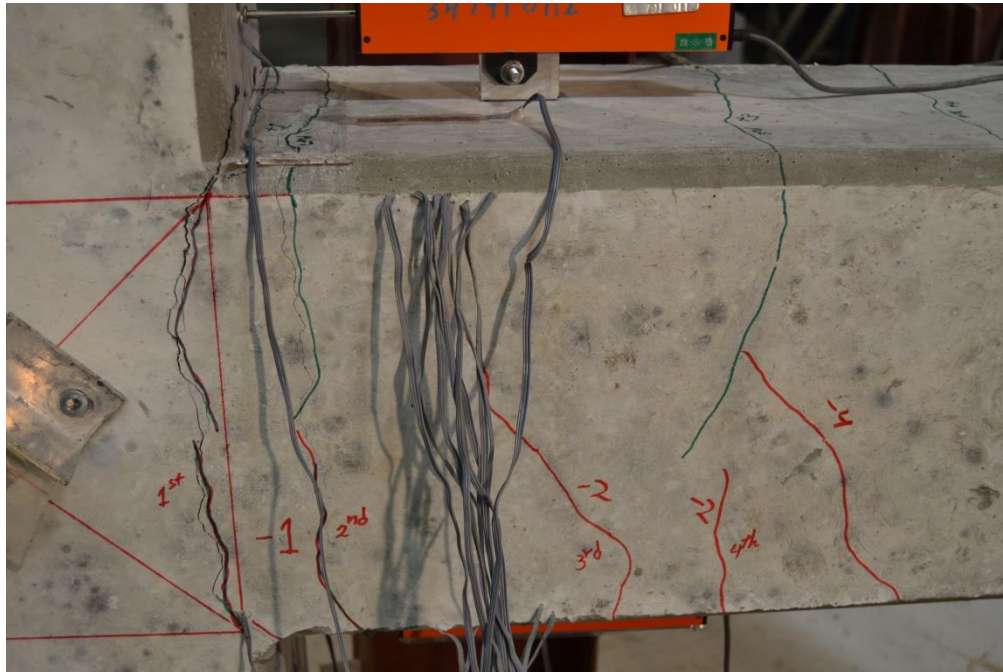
37: The formation of cracks for NiTi-BCJ-4 specimen
